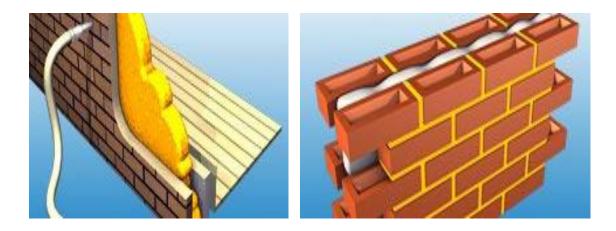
Typical Brick Formation for Cavity Walls [31].
